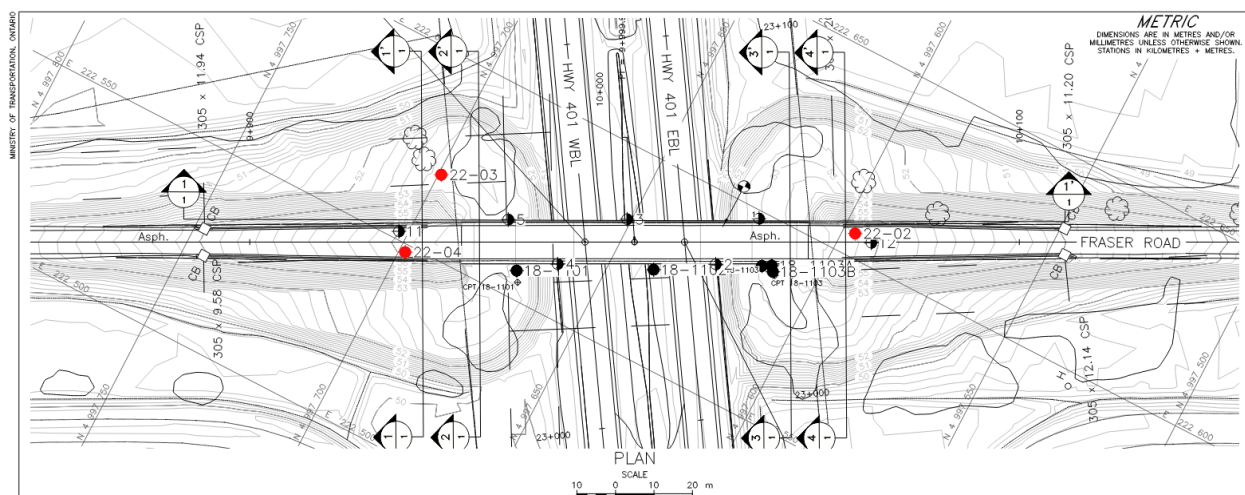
Plan view showing geometry of existing embankment with borehole locations (Ref: WSP's Drawing No. 1, GWP No. 4248-15-00)
